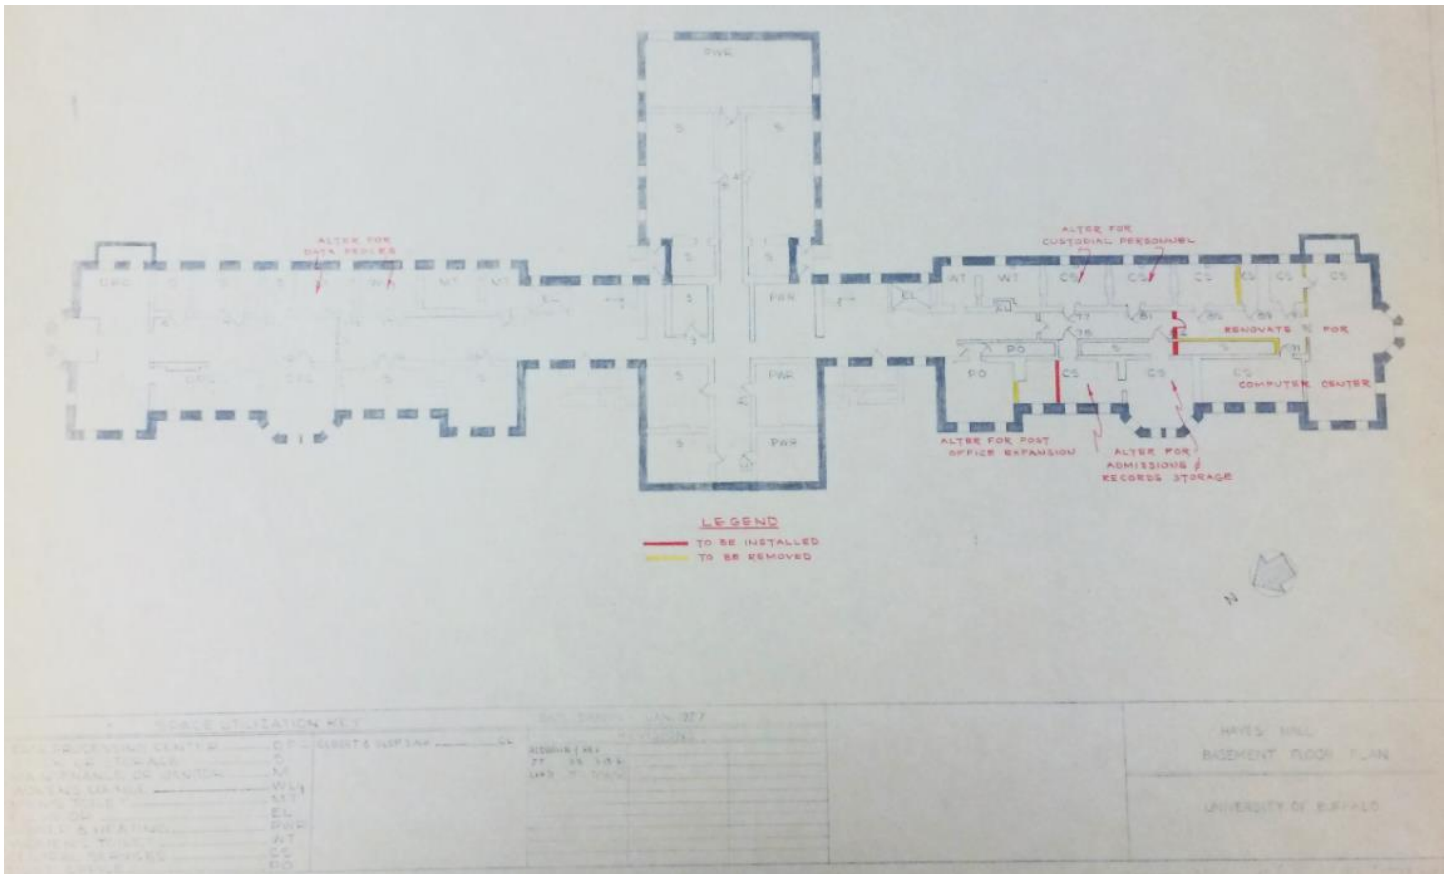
Plan of basement showing “Space Utilization.” Modern notes (2010-2015) are made on 1927 plan.<sup>63</sup>
